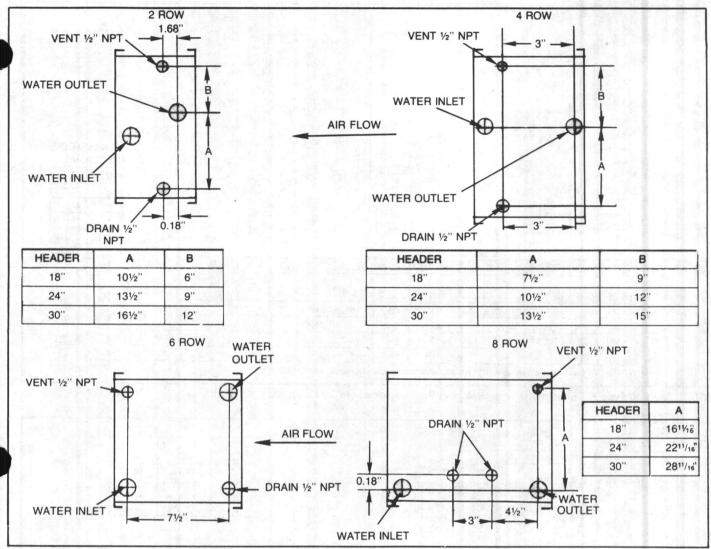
B - Draw-Thru Unit Coil Section Details with View of Condensate Follower
